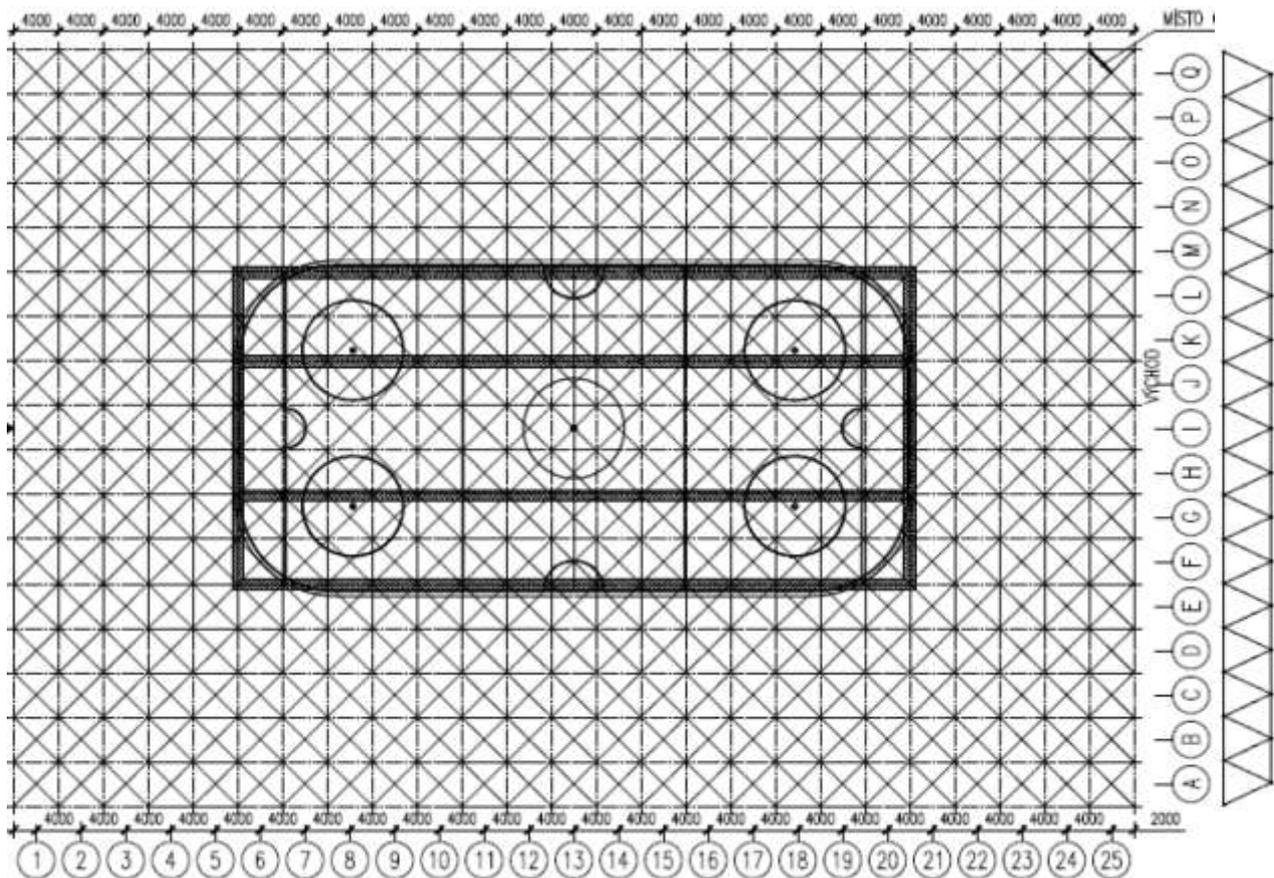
Winter sport stadium in Olomouc city – scheme of spatial truss grid of steel roof structure (plan and transverse section).
